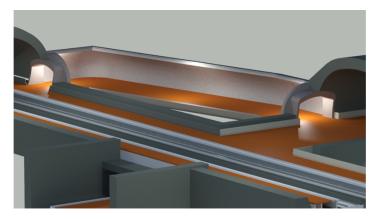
Overview of new pedestrian tunnel with connections to both platforms.
